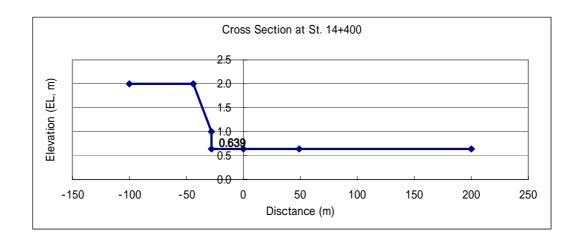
Cross Section of the Dondra Lagoon Channel (2/3)
